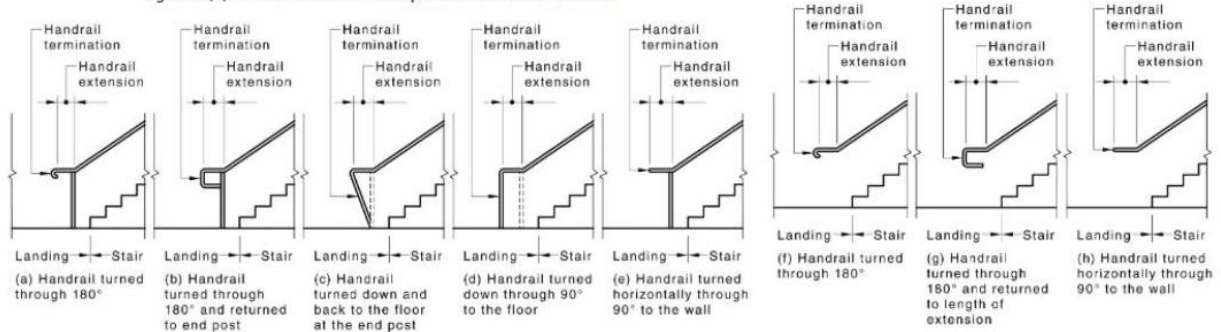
(A) — Ramp handrails — Examples of handrail terminations
